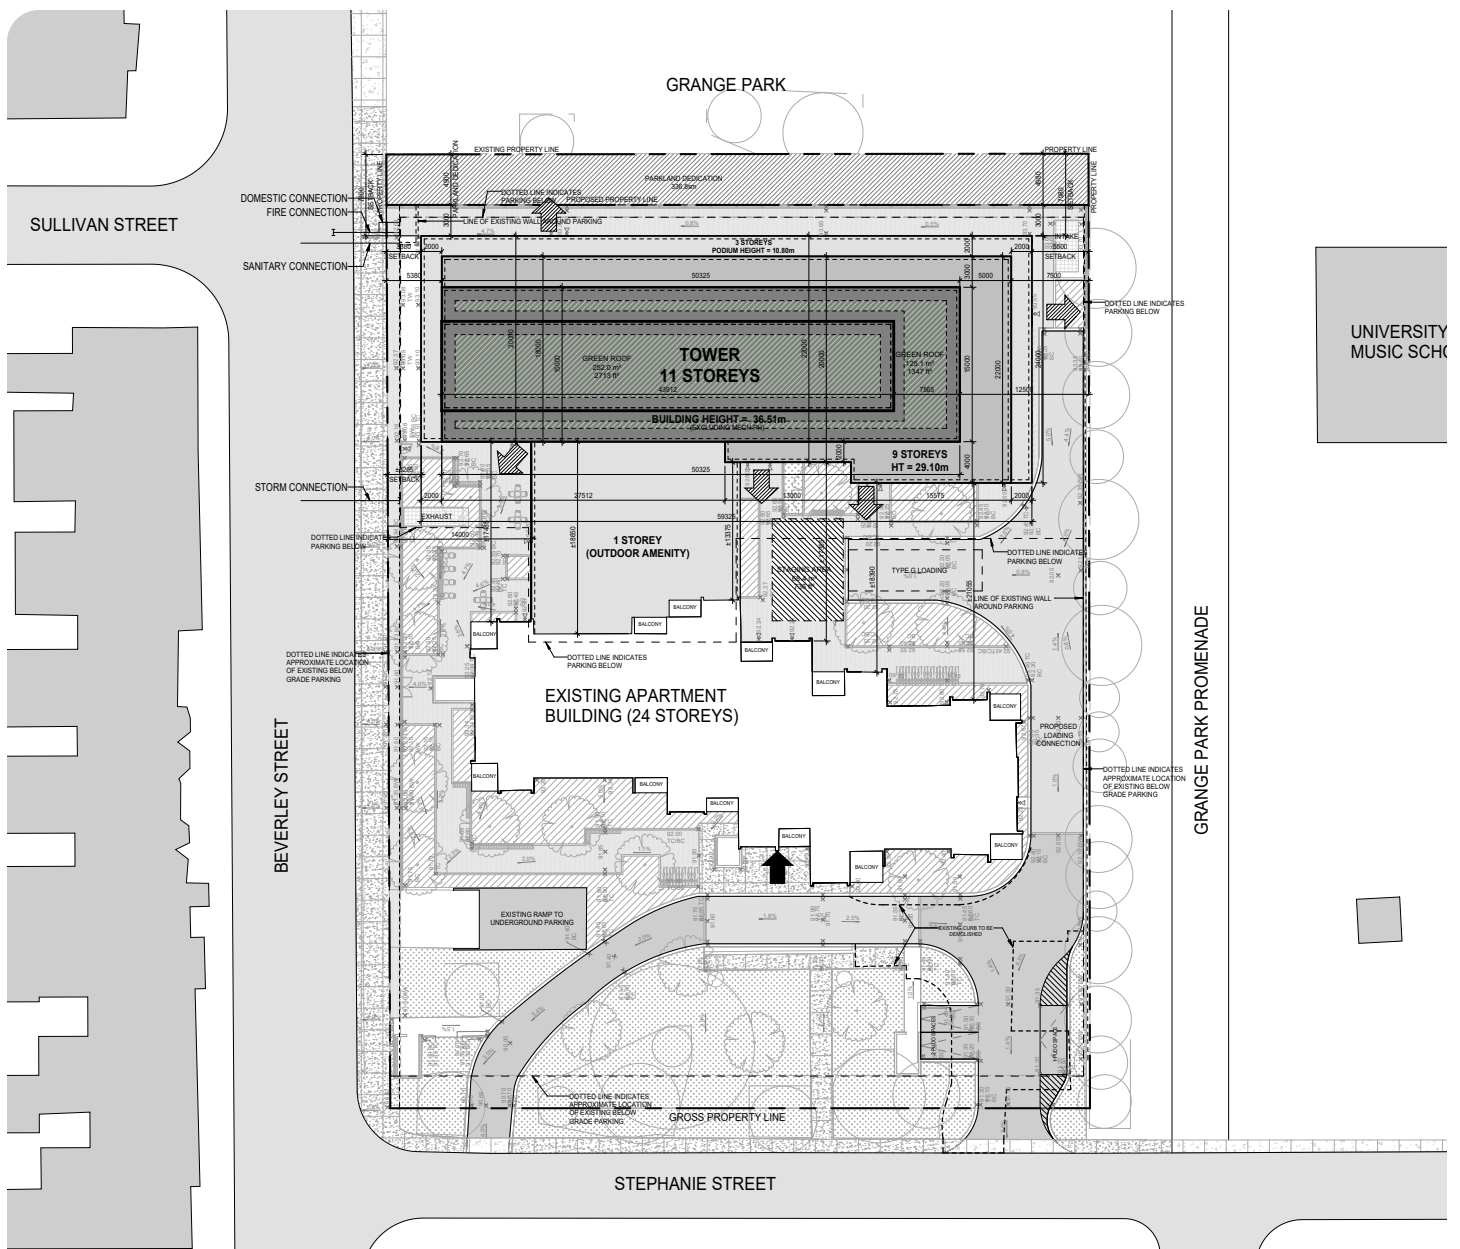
Site Plan (Provided by BDP Quadrangle Architects)
